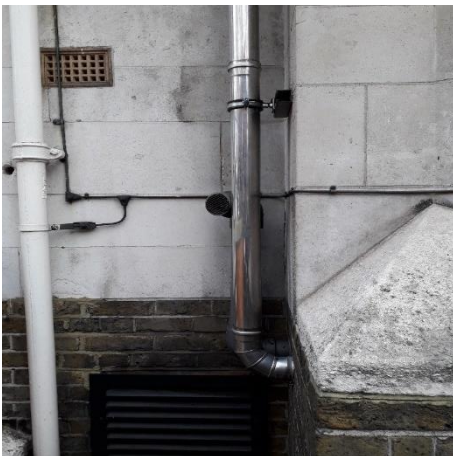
Gas Fired Water Heater Flue Penetration Exiting Boiler room
